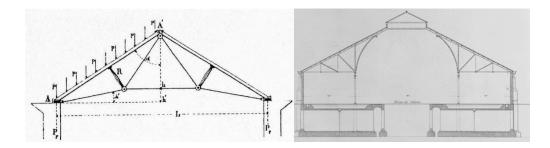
Camille Polonceau truss (left); Robert Stephenson's locomotive roundhouse (right)
